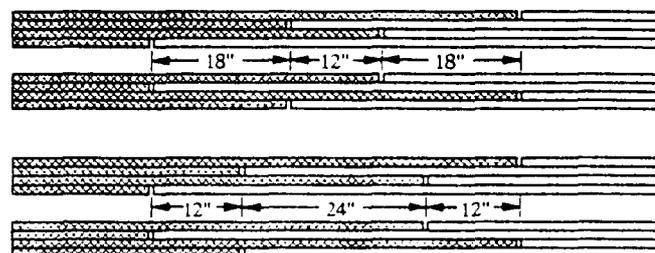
Arrangement of joint in four-layer assemblies, spacing of end joints not fixed.
